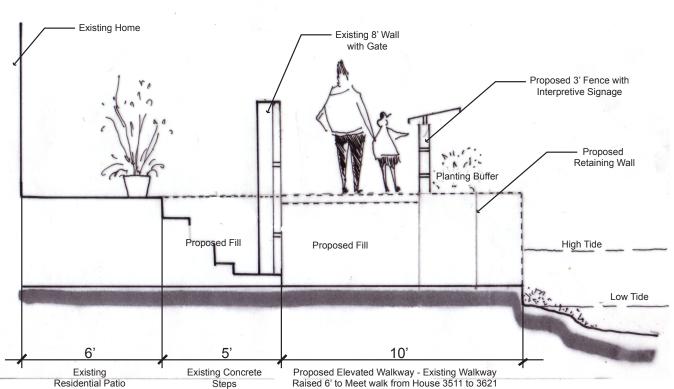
Proposed section of east bank along historic walkway, Alt 2
